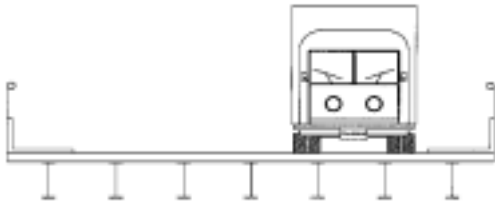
The Cross Section of Concrete-Slab-Steel-Girder
